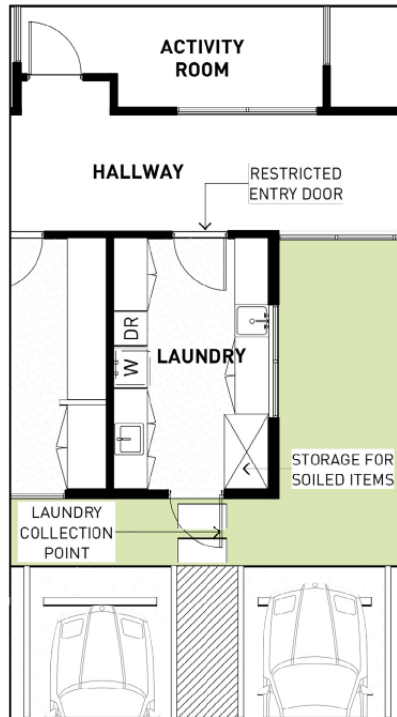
A typical child care facility laundry layout. External access may be provided if laundry is done off site or for deliveries.
